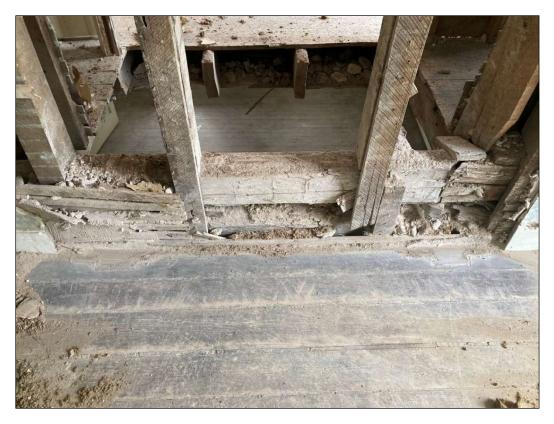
Second floor, bedroom above the dining room (log section). Looking at the ghosts on the floor of a former mantel and the logs in the wall indicating there was not a fireplace in this location. May 2023. Photo by the author.
